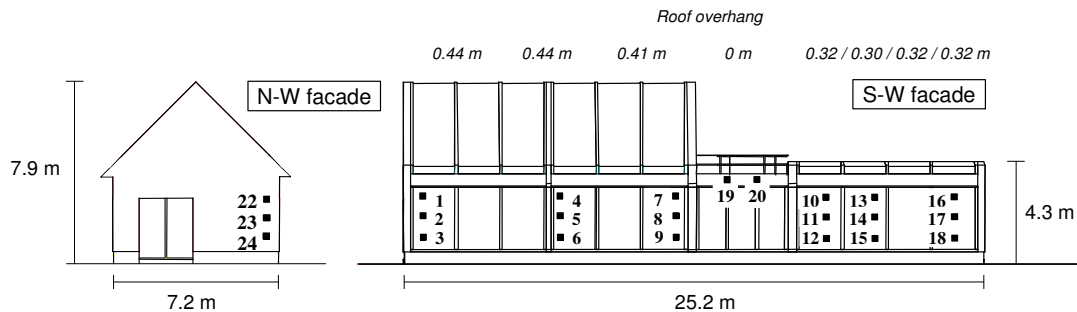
VLIET test building: north-west and south-west facade. The building dimensions (including roof overhang) and the positions of the wind-driven rain gauges (1-20, 22-24) are indicated.
